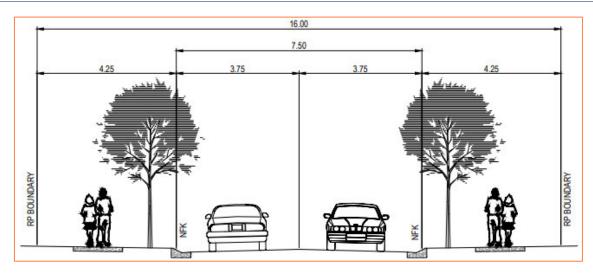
Council Typical Example with No Parking – Neighbourhood Road (City Plan – BSD1021)
